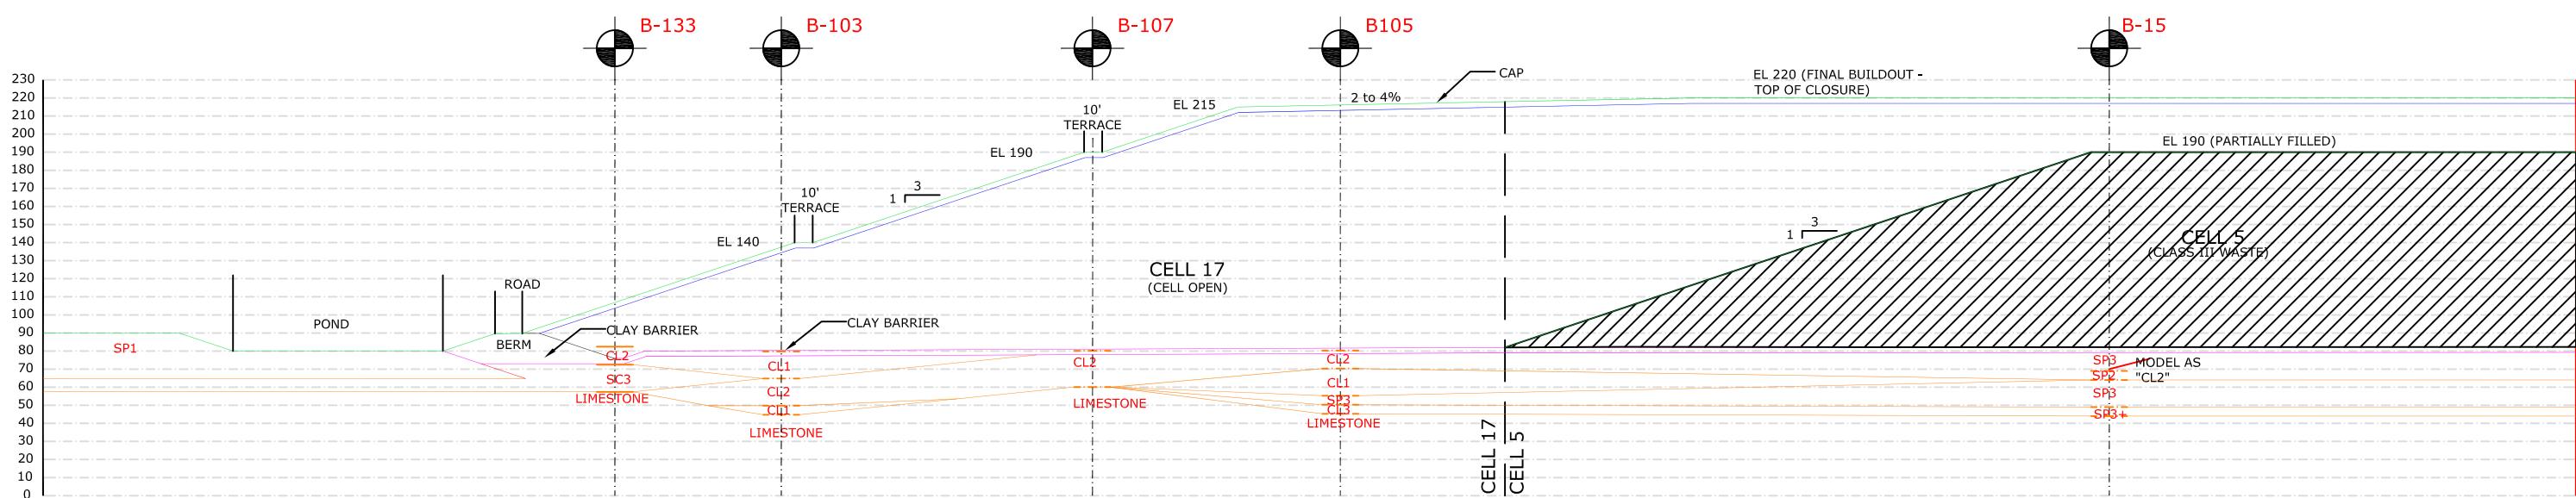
(REVISED FEB 2020). CELL 17 OPEN, NORTH/SOUTH SLOPE STABILITY SECTION
